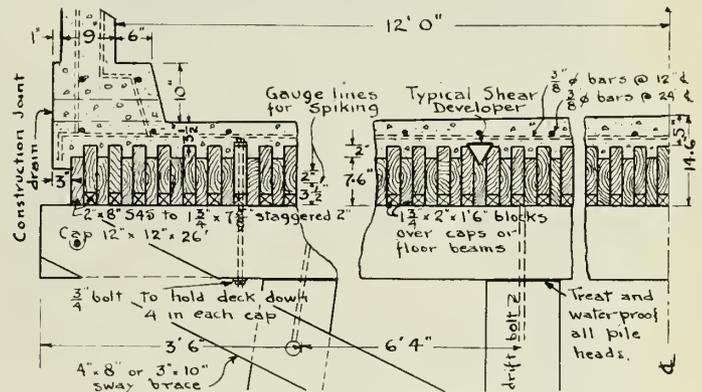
Timber Substructure and Stringer System Supporting Concrete Deck.
